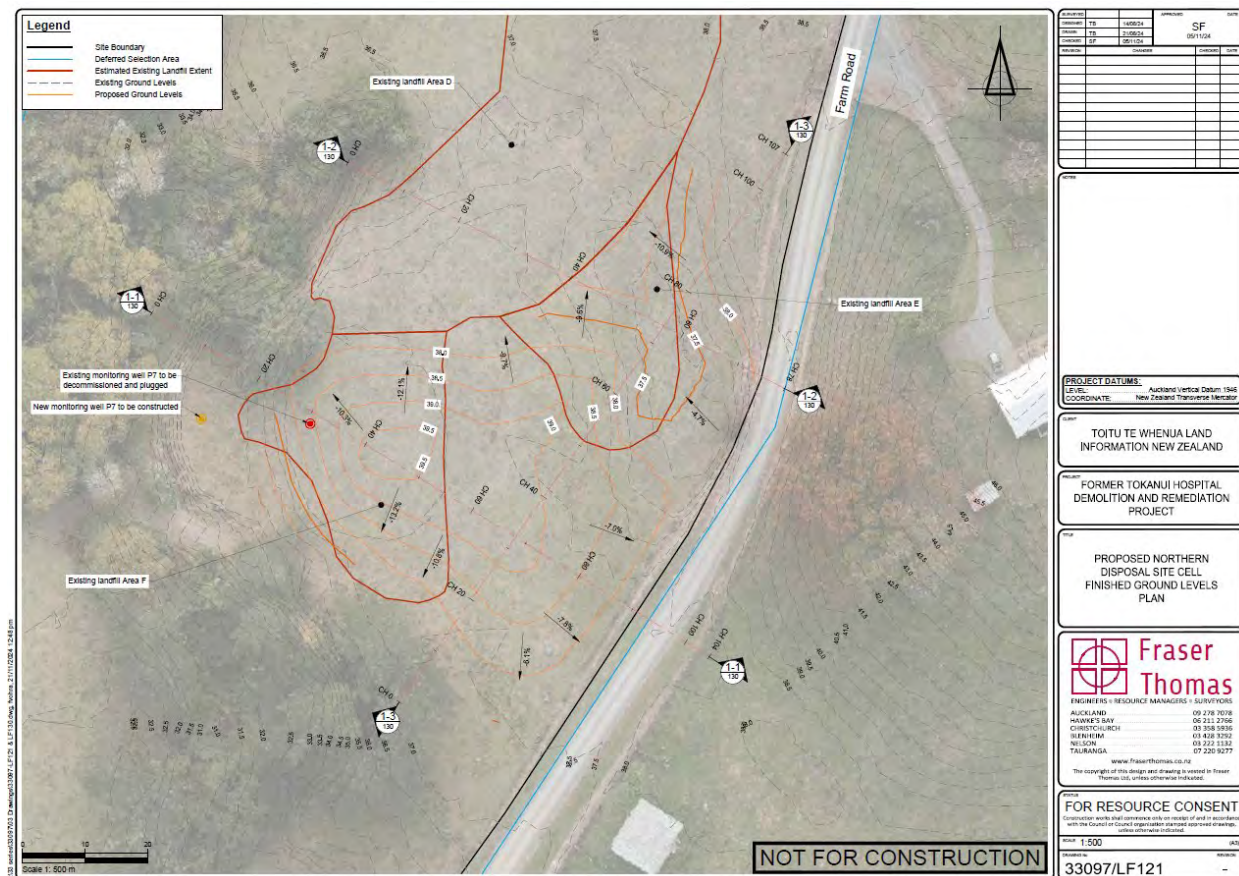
Proposed Northern Disposal Site Cell – Finished Ground Levels Plan
